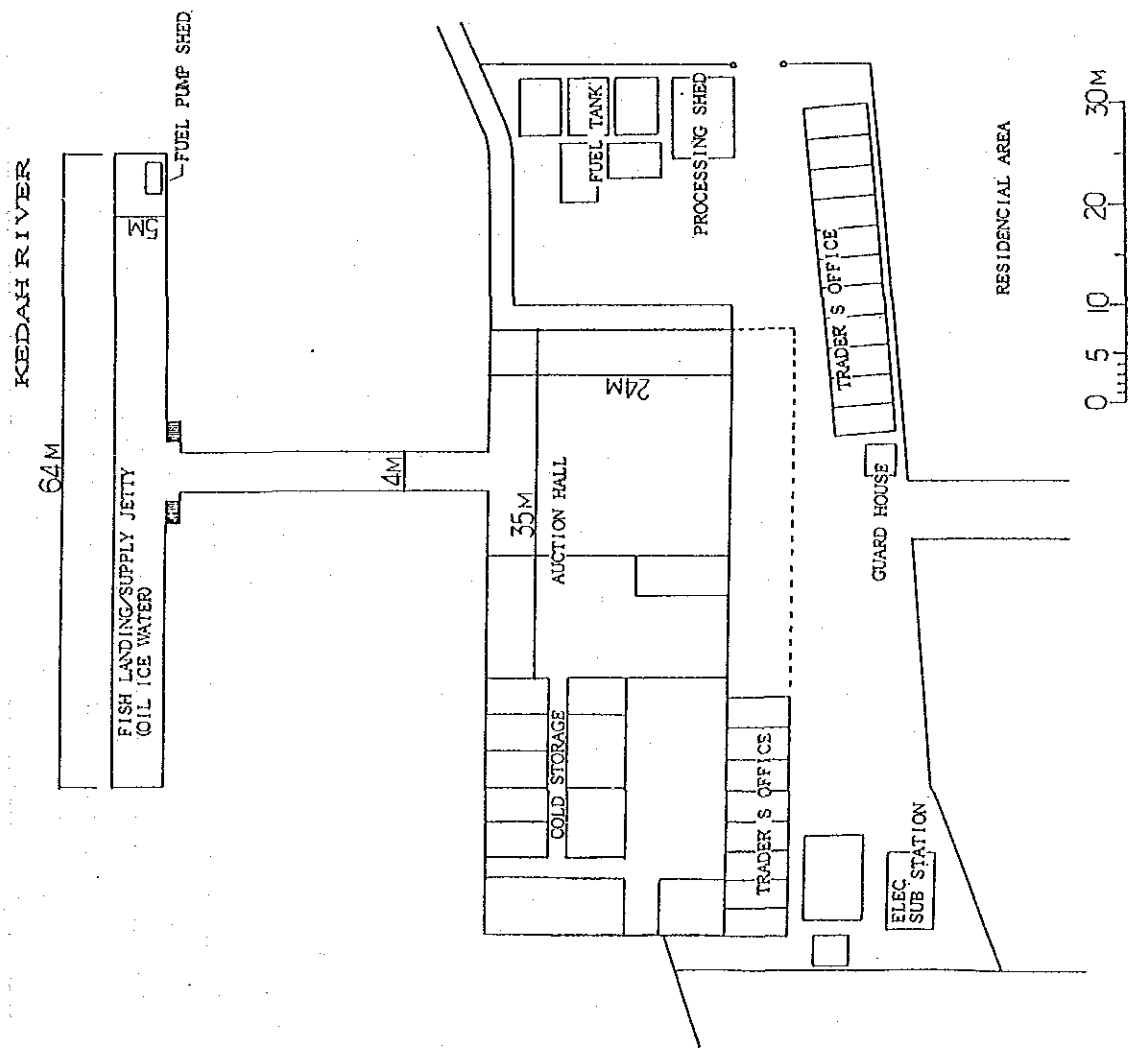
General Layout Plan of LKIM Complex of Kuala Kedah
